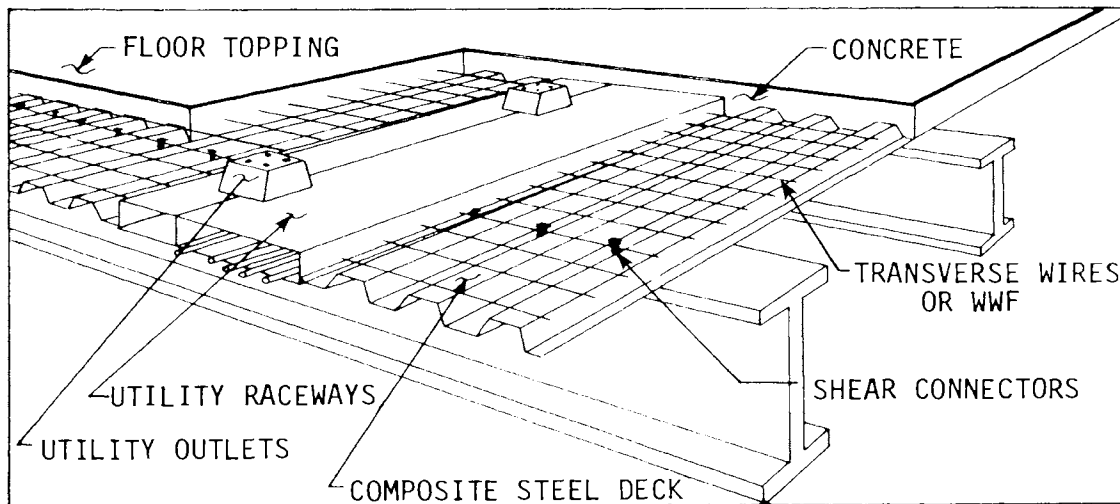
Typical building floor construction utilizing cold-formed steel decking with composite support beams.
